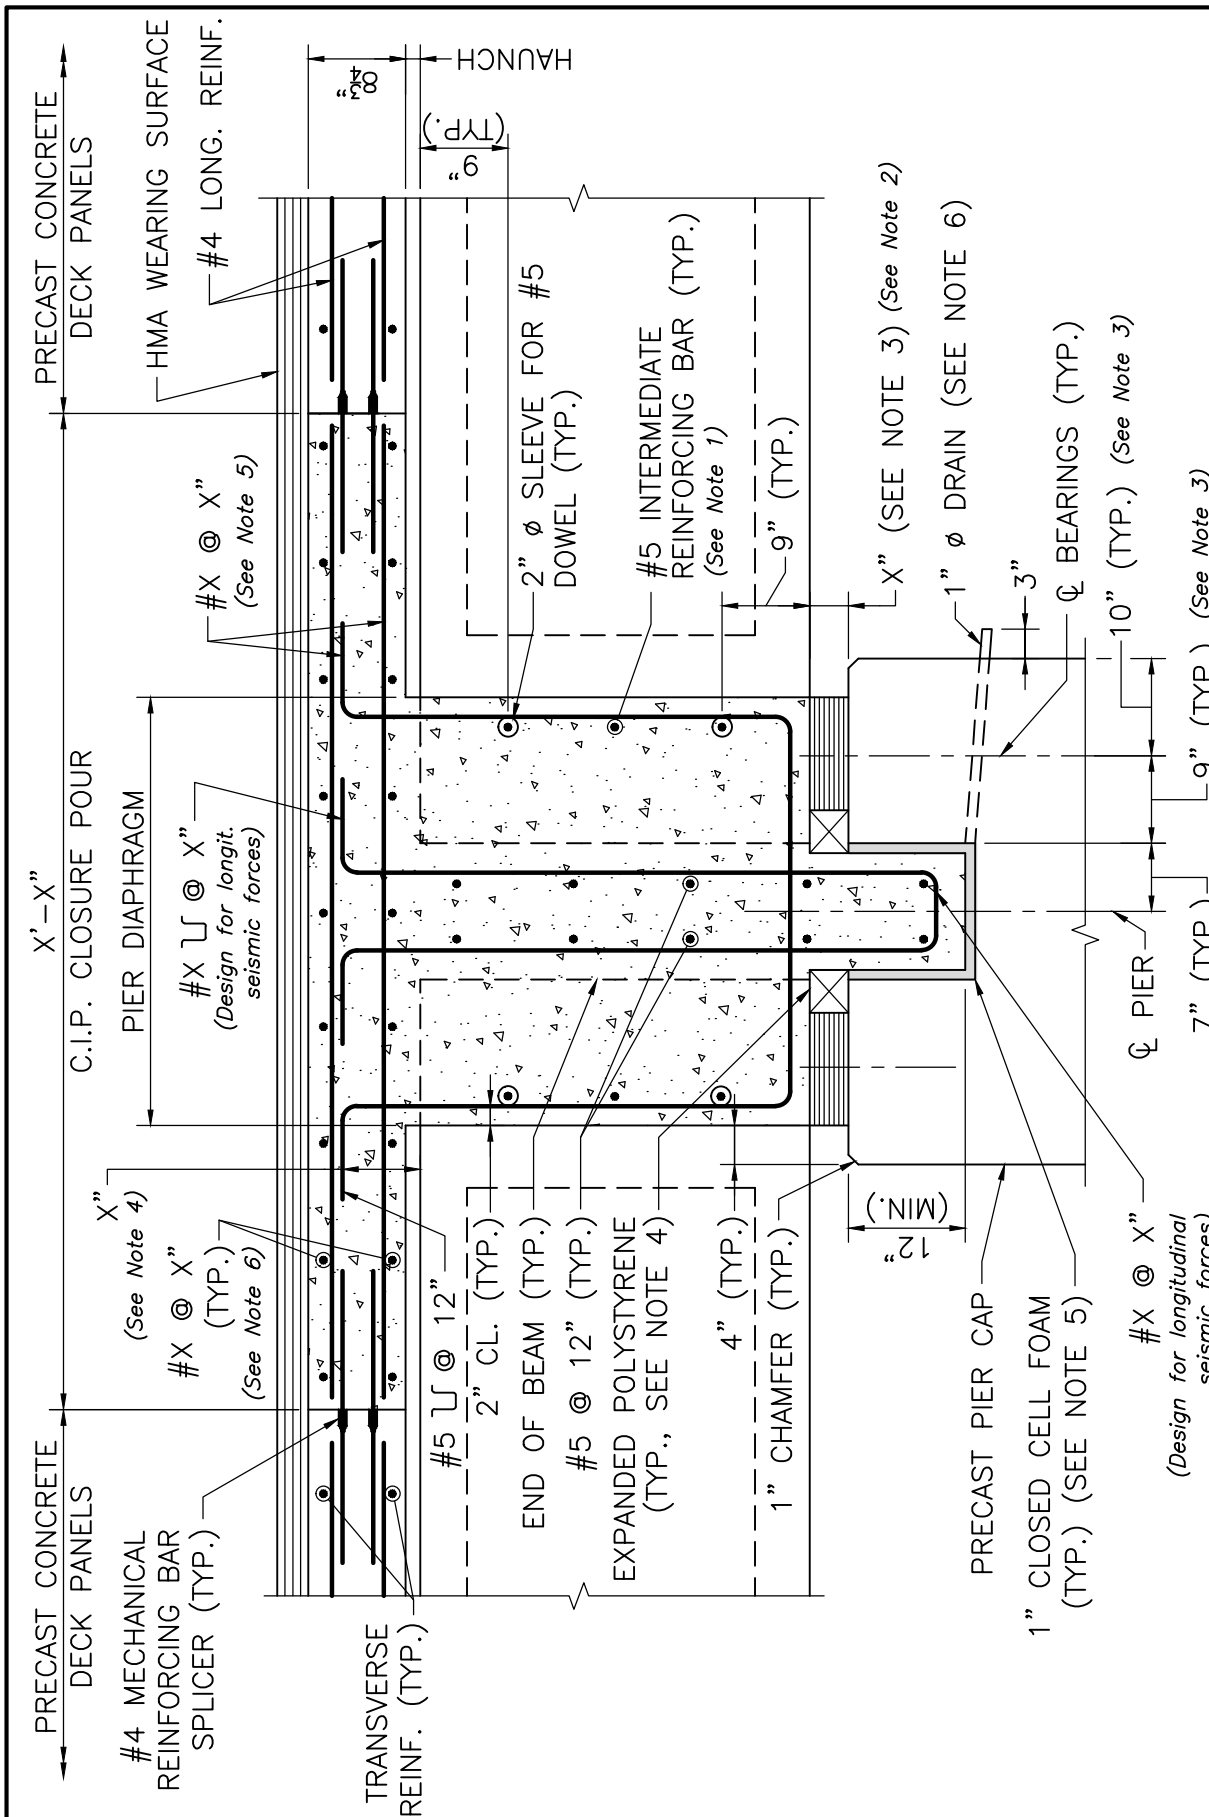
DETAILS OVER PIER NOTES FOR NEBT BEAMS
